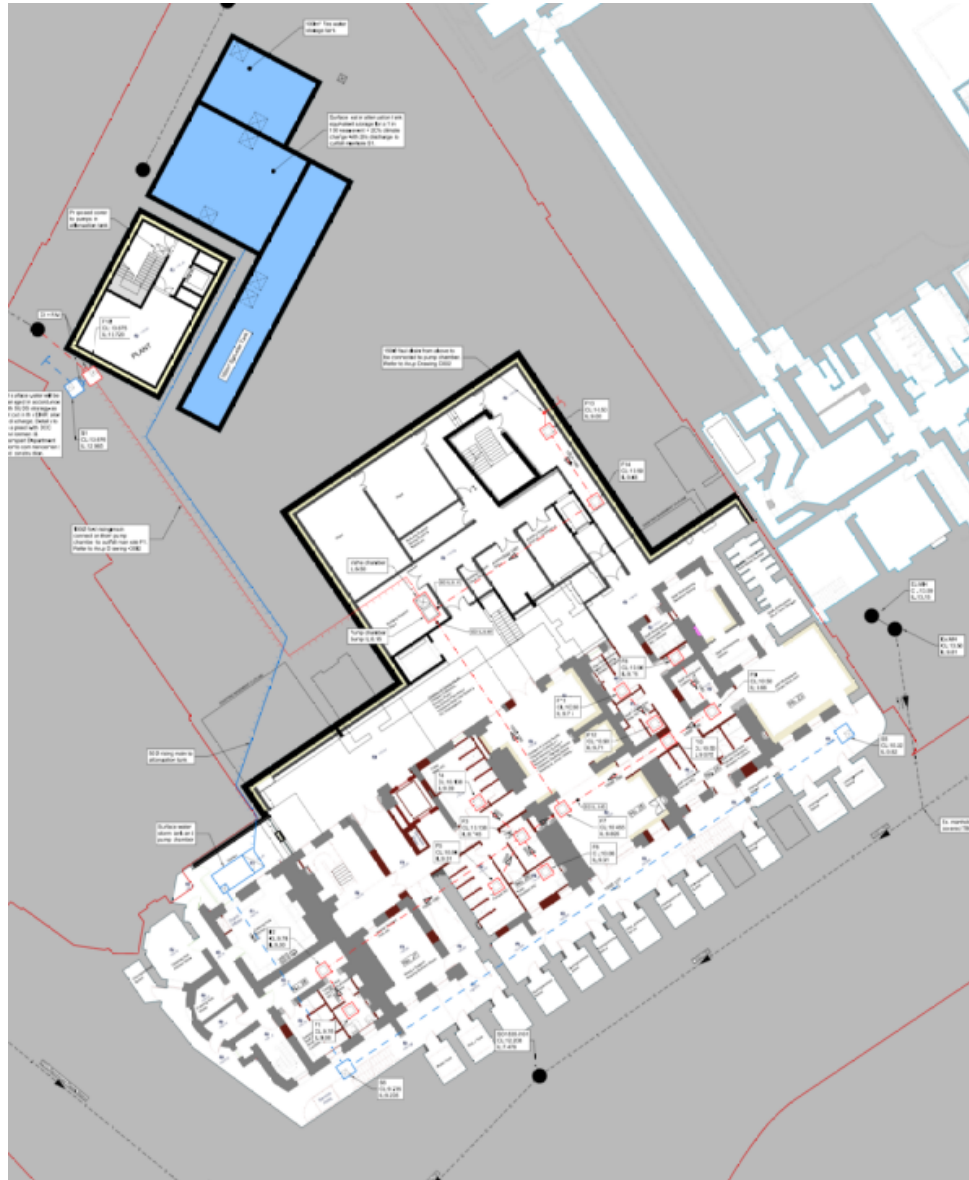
Proposed Surface Water Drainage – Lower Ground Floor
